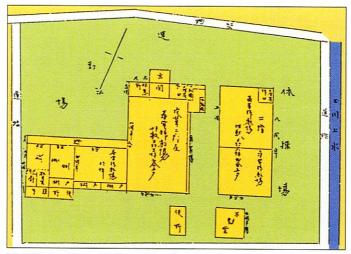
Higashitama Gakko building plan view. A two-story four-classroom building and a one-story building for teachers' room and two classrooms. The playground was small so students played in the neighboring garden of the priest Miyamoto.
